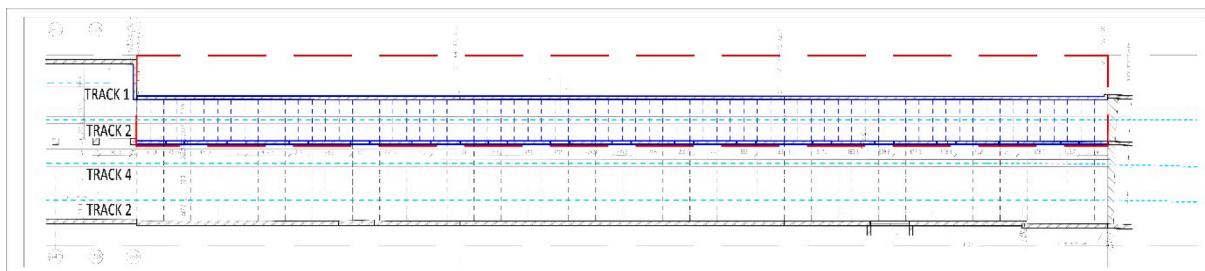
Plan of the surveyed section of the underground tunnel, the dashed line shows the extent of reconstruction, and the blue colour indicates the elements of the structure subject to analysis.
